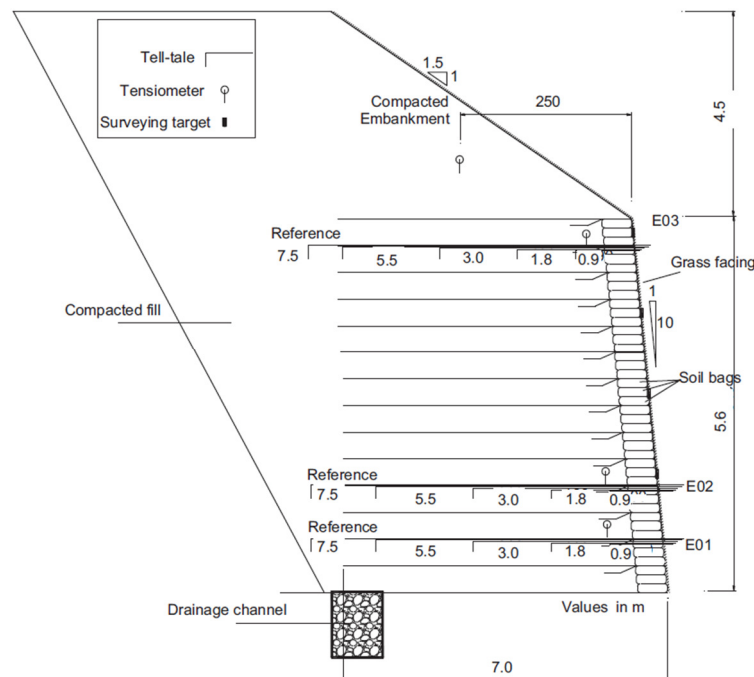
Cross-section and instrumentation layout of the full-scale GRS walls (Portelinha et al. 2014).
